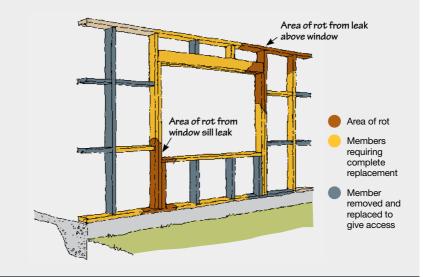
Damage caused by leaks from above and from window sill requiring 100% replacement of window sill
